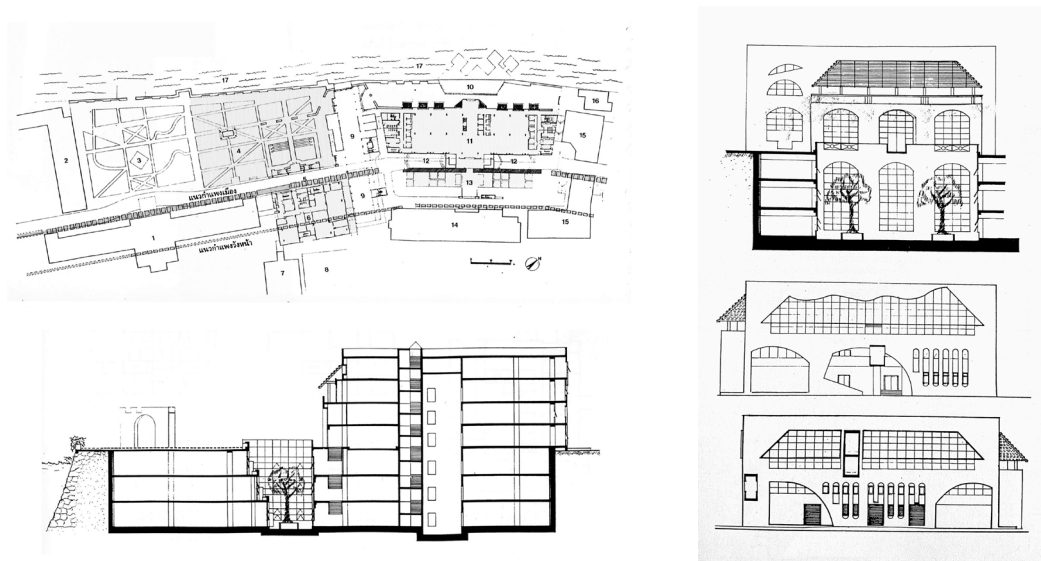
(top left) Site plan showing the original city wall and the Front Palace wall (bottom left) Building sections (right) Elevations of the buildings (source: The Association of Siamese Architects under Royal Patronage (1997).
